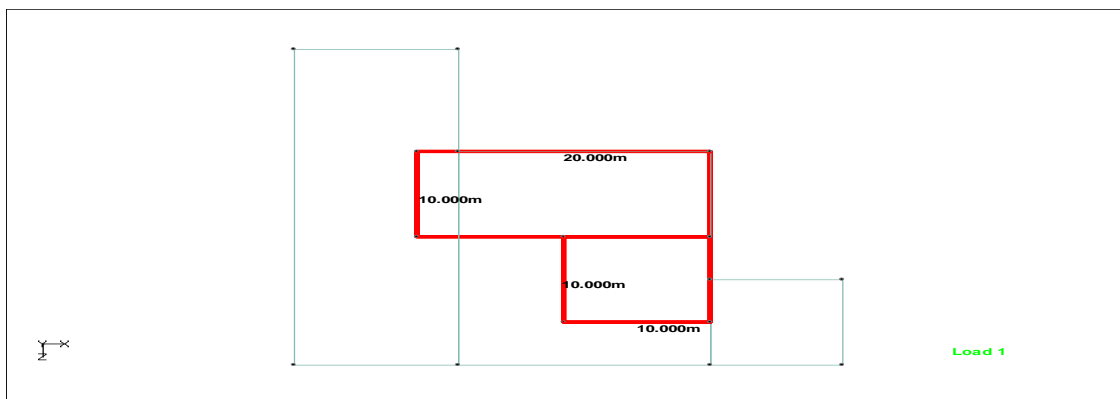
Layout plan of Model Frame 4 (Two sided swimming pool at the re entrant corner)
